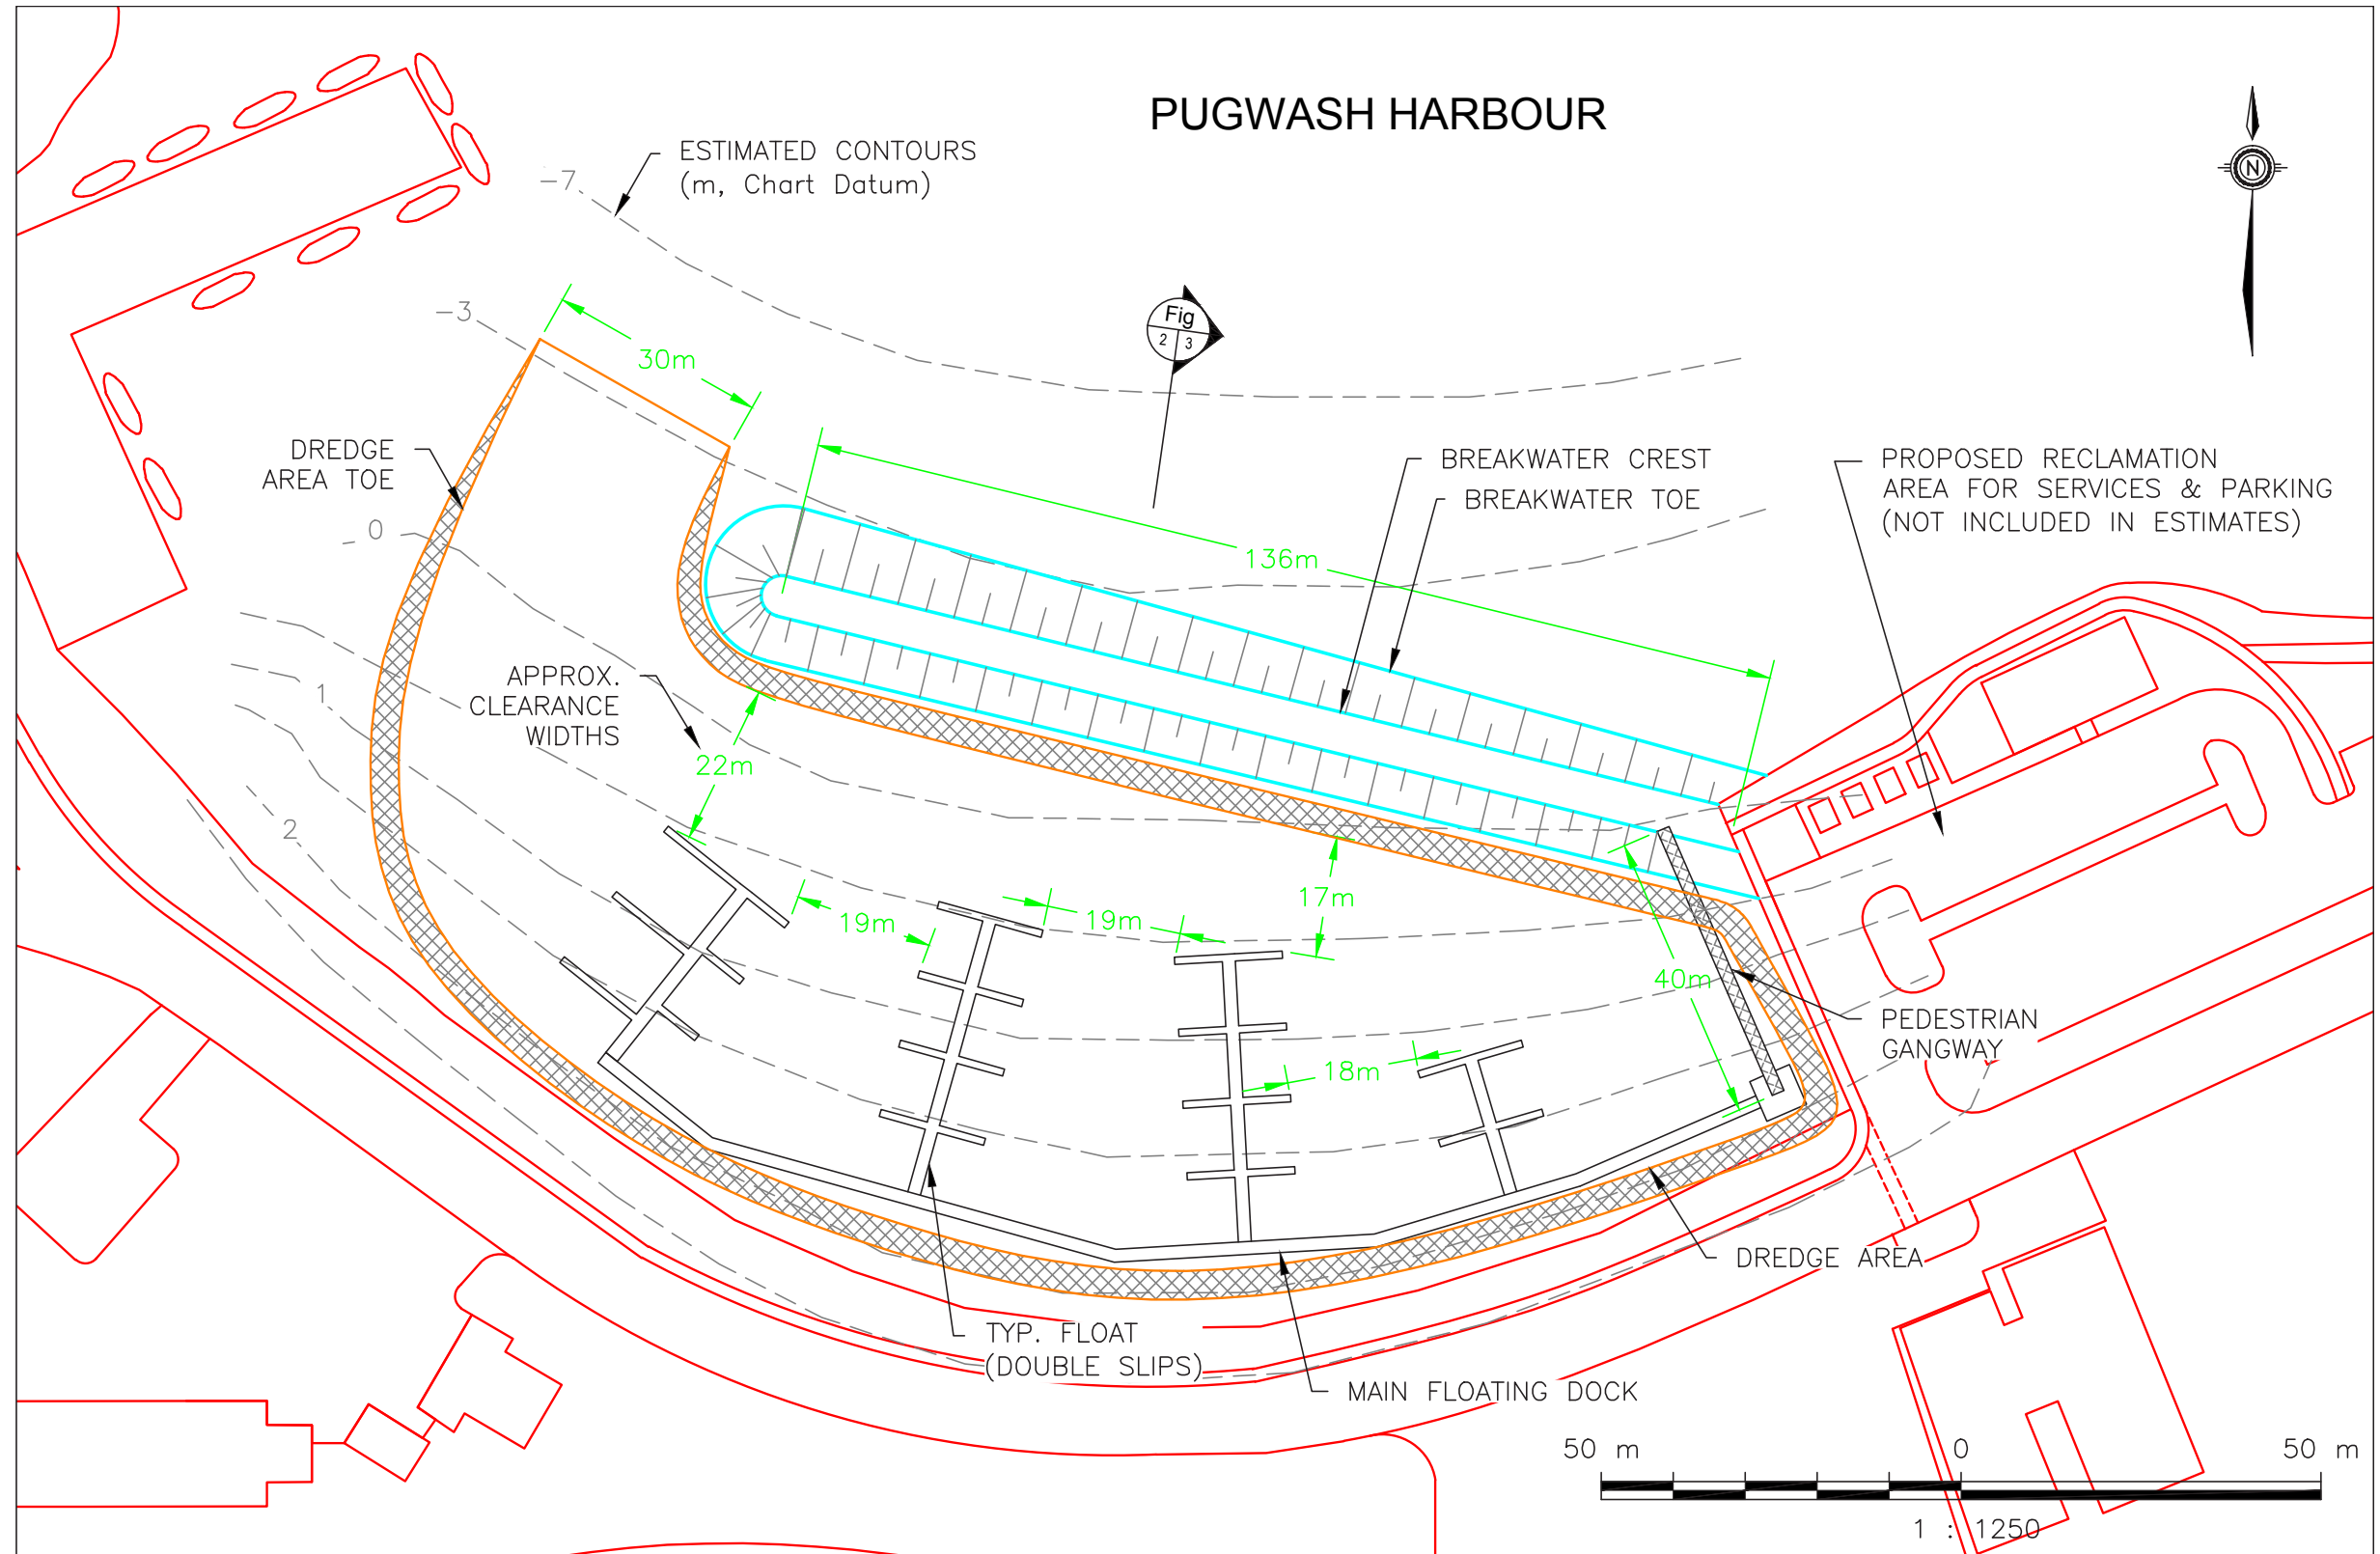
General Arrangement Plan of Marina Basin and Breakwater
